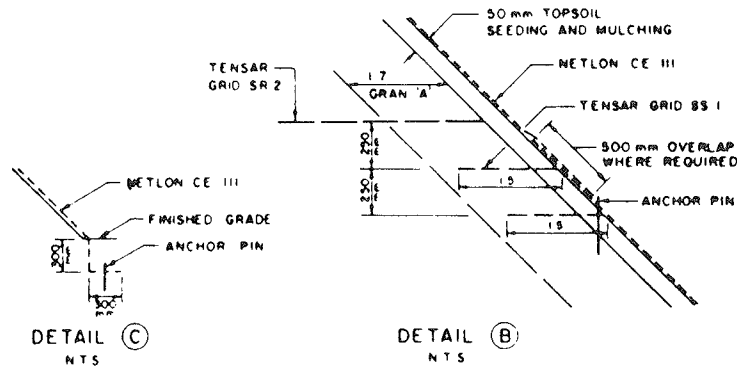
Reinforced embankment at Brampton, Ontario, Canada.
